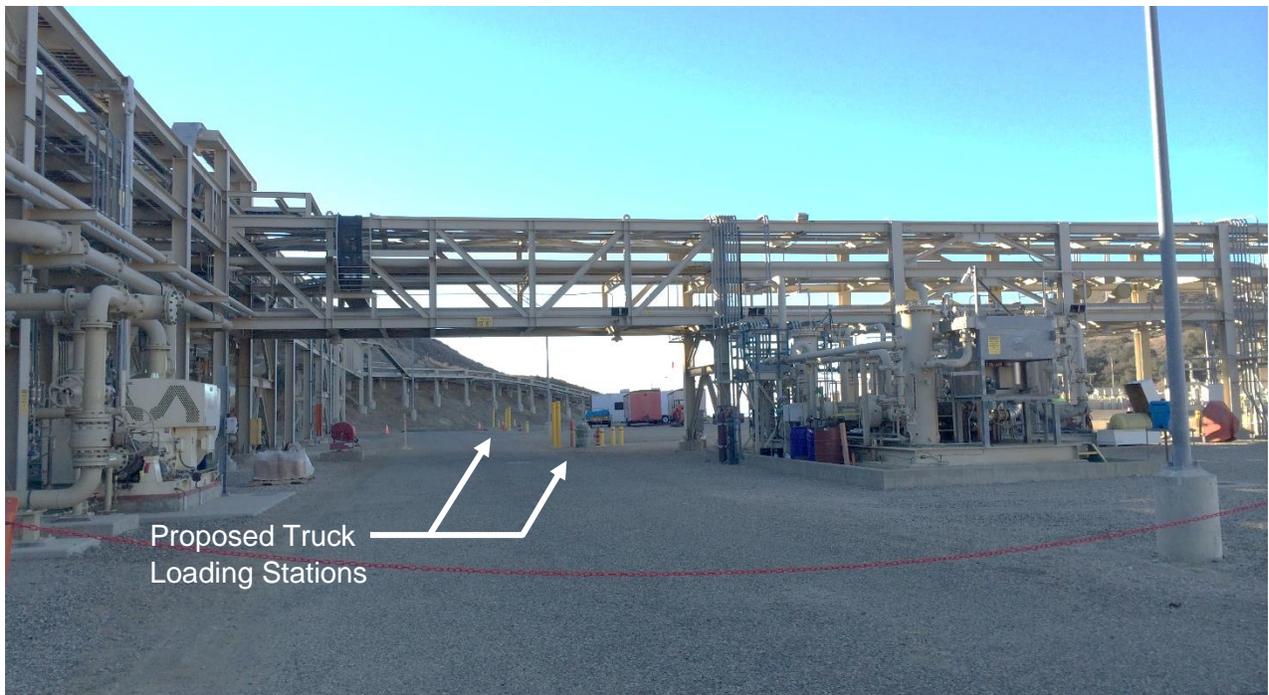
Proposed truck loading locations at LFC, photo taken from north facing south
